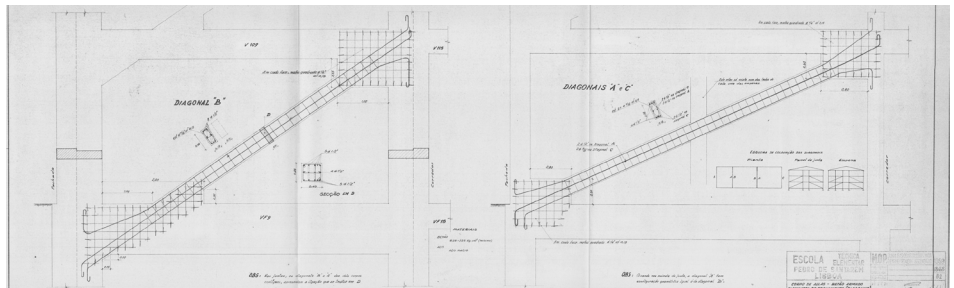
Escola Secundária Pedro de Santarém (1959-1970), Lisbon. Drawing of the original design with the diagonal structural element in reinforced concrete.
